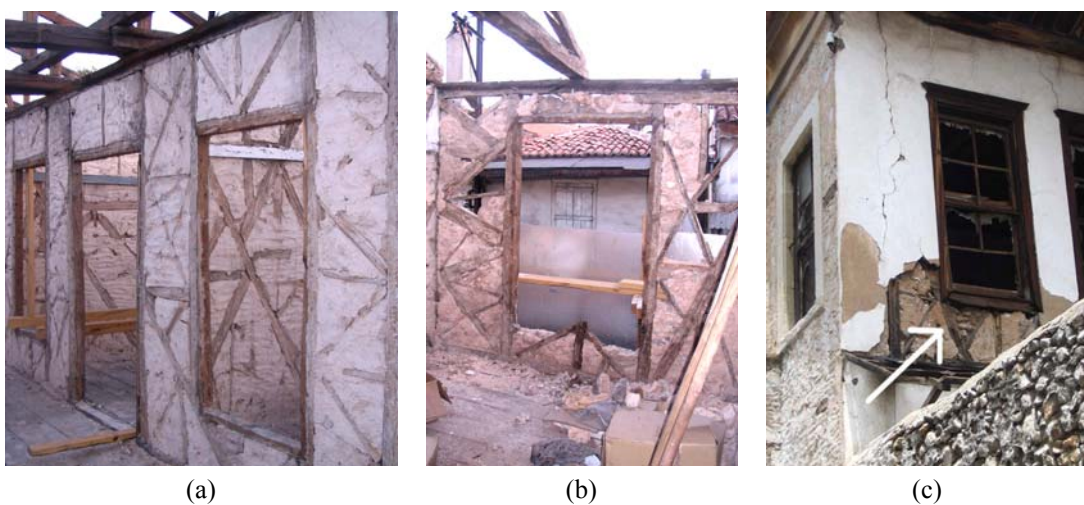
a. and b. Openings in *hımış* wall (Saatli Kule St. No: 70), c. Opening set on diagonal bracing at the corner Süleymanbey St. No: 10
